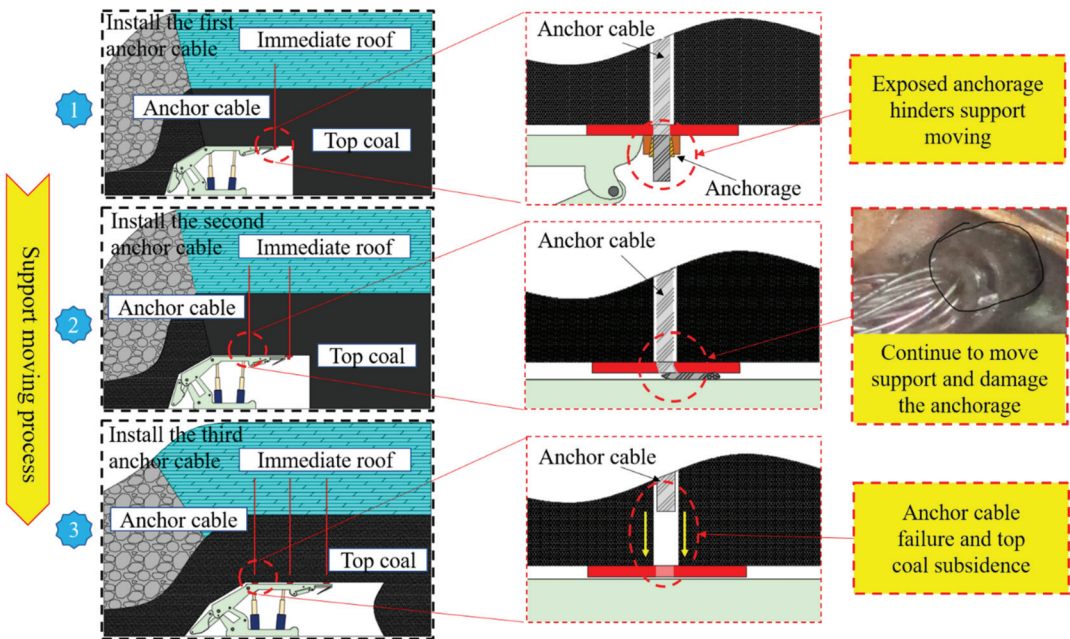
Disadvantages of exposed anchorages of the anchor cable.
